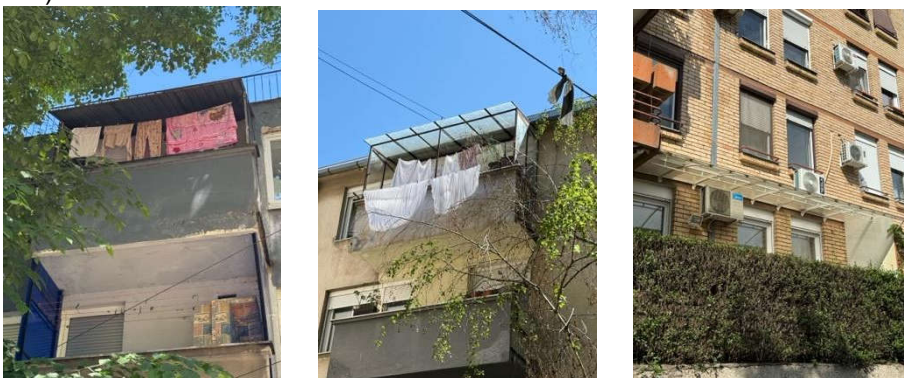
Examples of construction of canopies over private open areas in apartment buildings in Niš, source: B. Stoiljković
